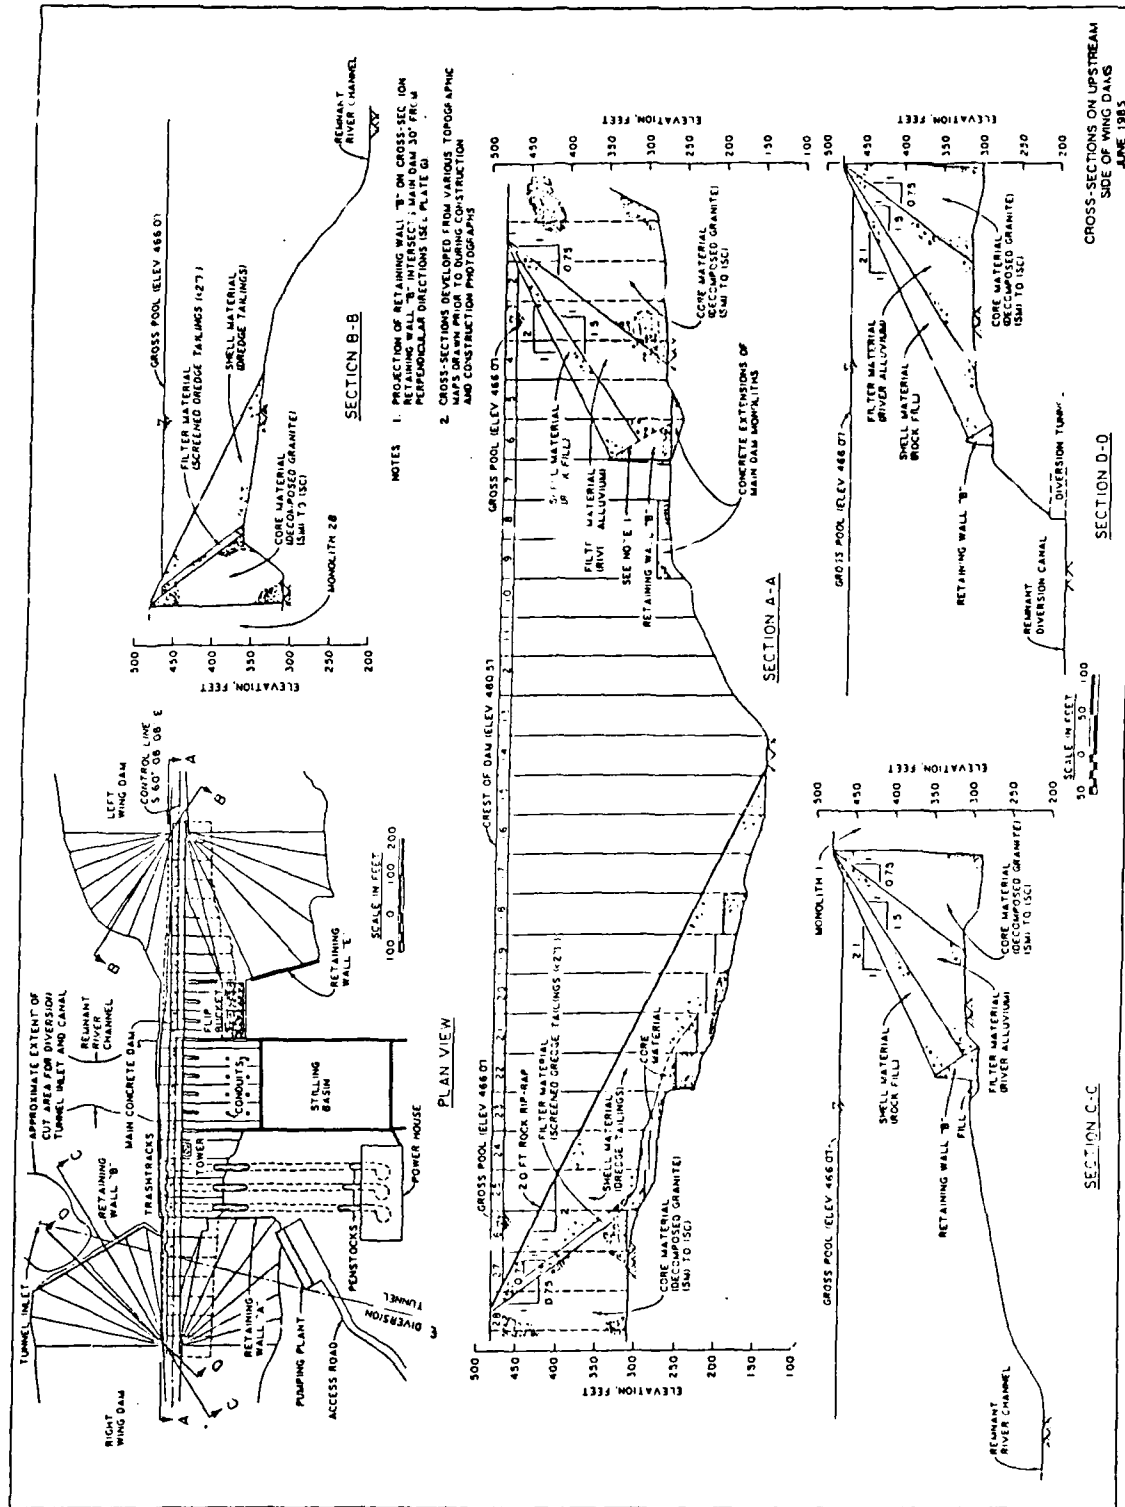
Plan and sections of upstream envelopment areas and Retaining Wall B
